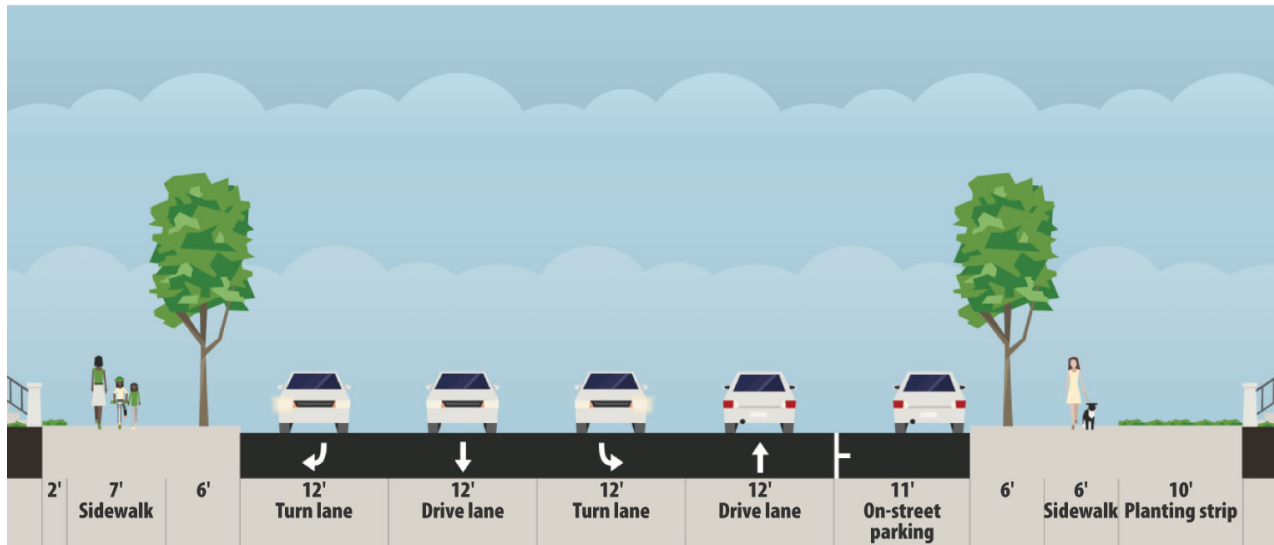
Typical Section Between Capitol Street and MacDonald Street
